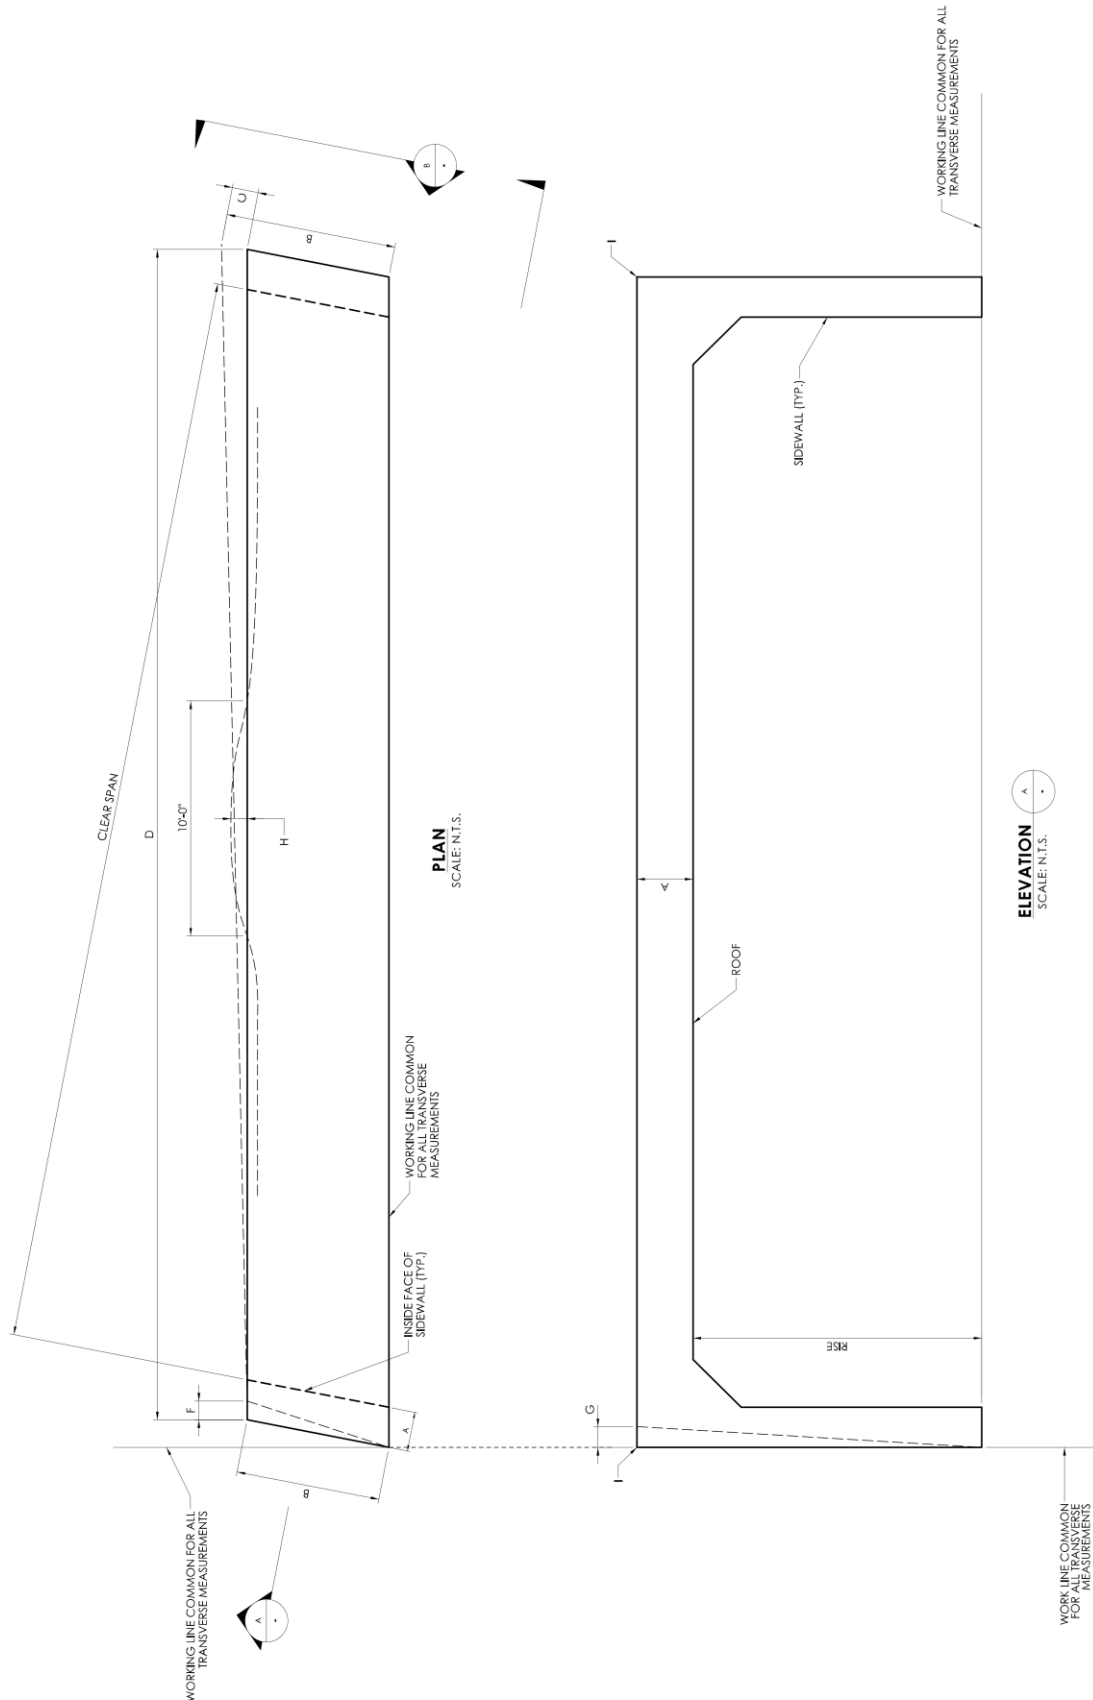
Three-Side Frame Fabrication Tolerances Plan View and Elevation View
